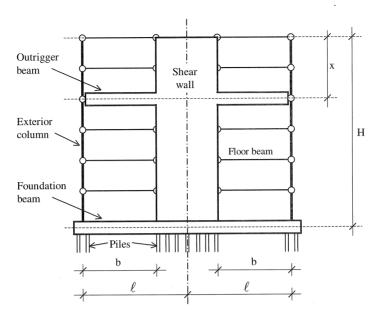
Outrigger braced shear wall structure on flexible foundation
